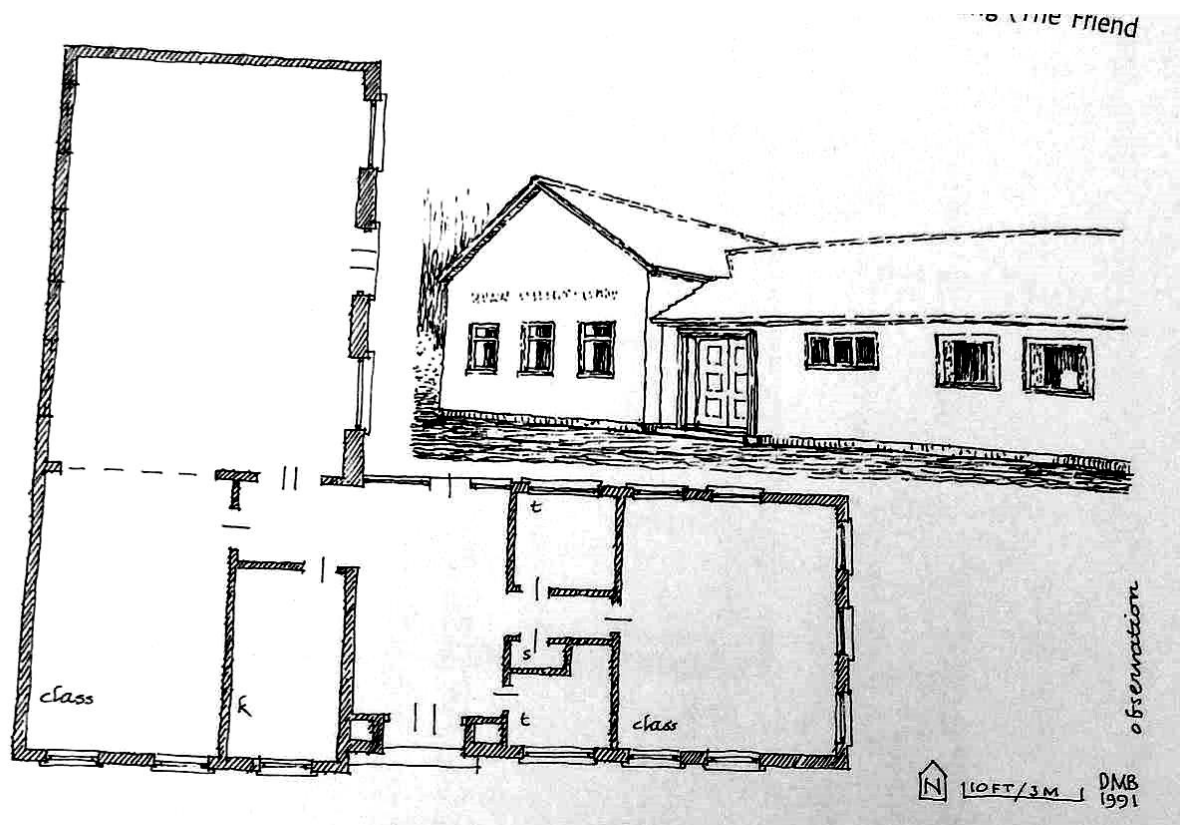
Plan and elevation of present meeting house, from Butler, Vol. 2, 1999, p. 528
